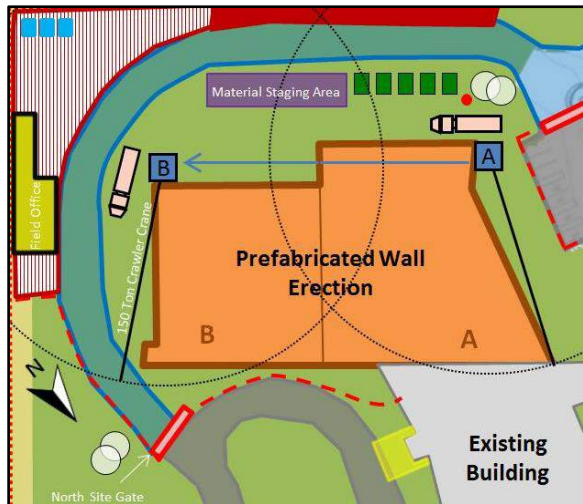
Site Layout for Prefabricated Wall Erection.
